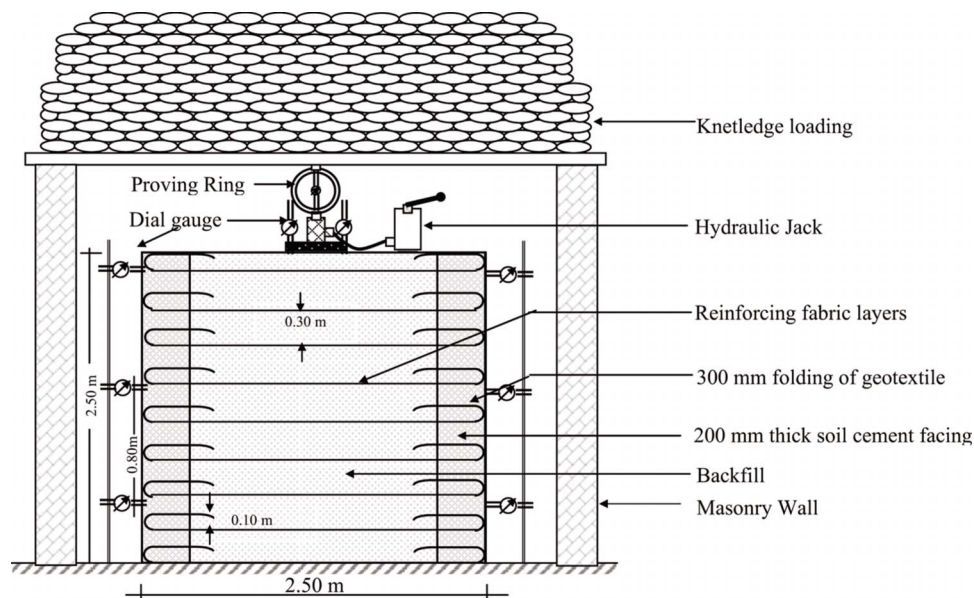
Schematic of experimental setup for load testing on geotextile-reinforced (Fibertex G-100) model wall
